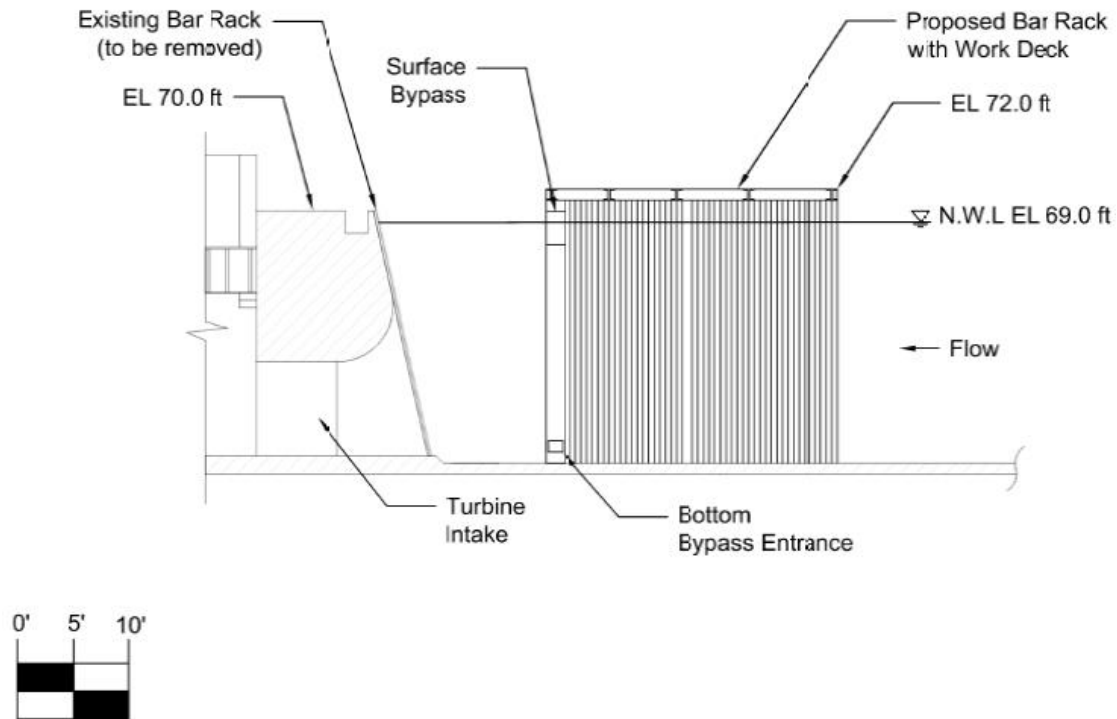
Conceptual Design of an angled bar rack installed at Mine Falls (section view).
